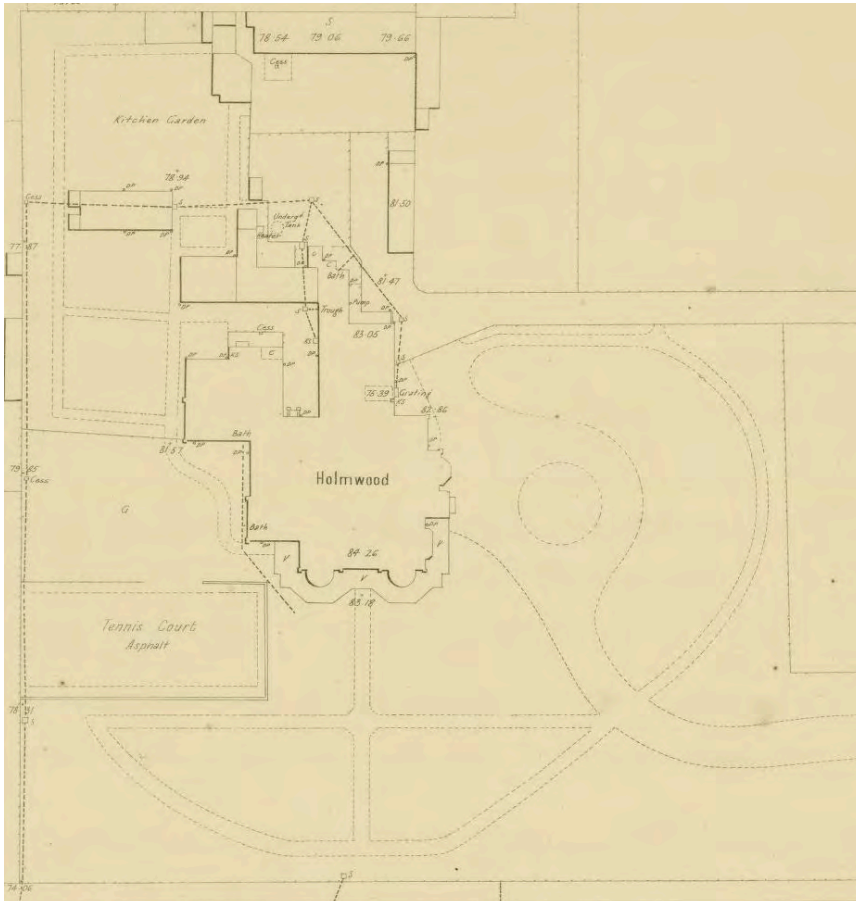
Extract from MMBW Detail Plan no. 1420 showing 'Holmwood' in 1900
